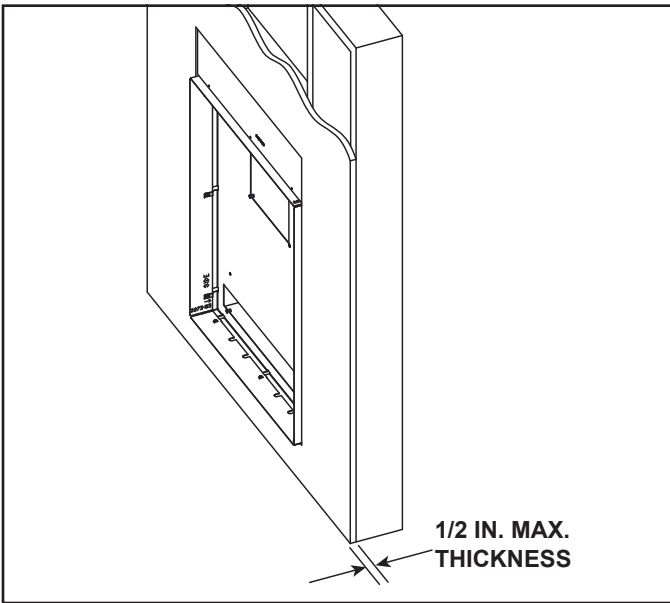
In-Wall Tub Installation - Sheet Rock Thickness
